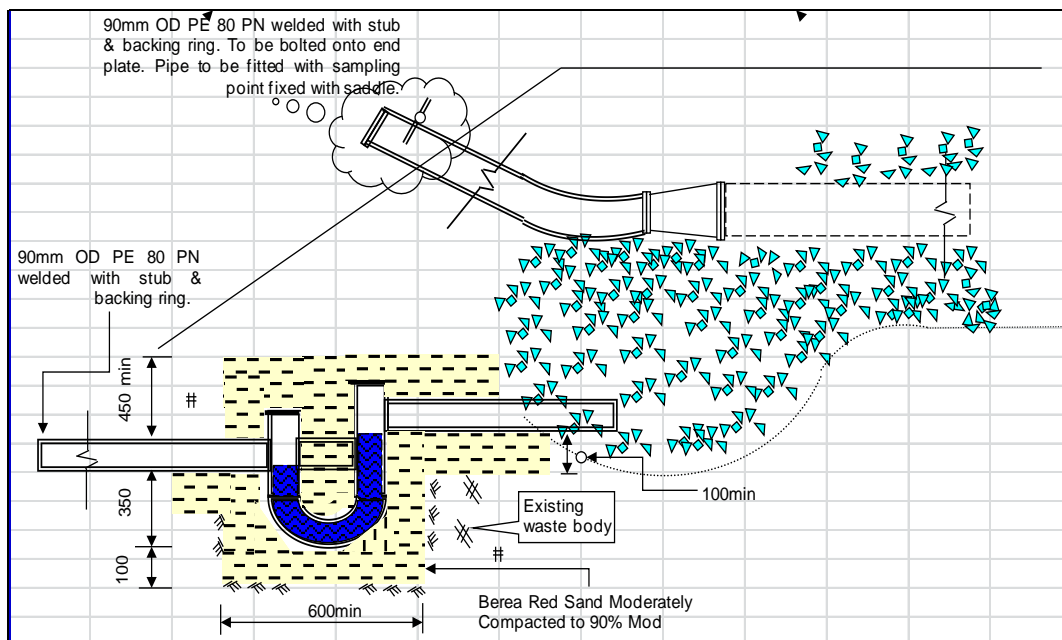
Typical "knock out Pots" – Note to Scale, Moodley, 2011
